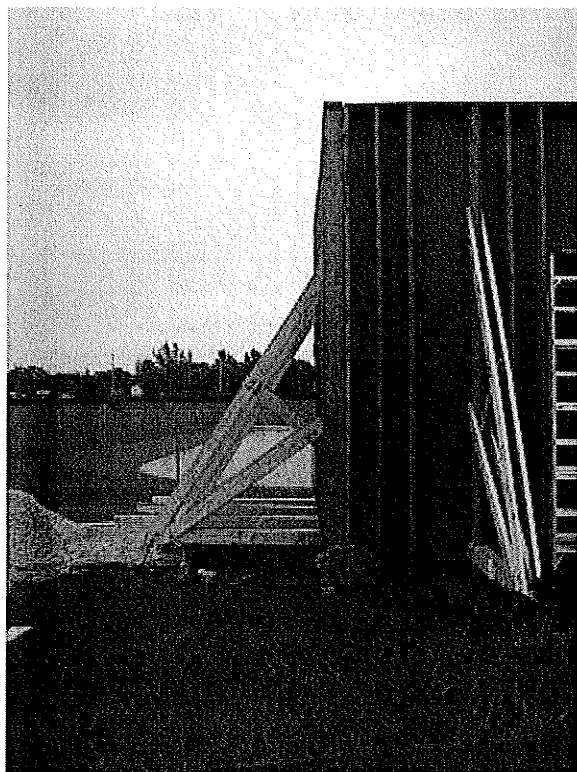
East and West Truss bracing systems under construction (view to the South).
